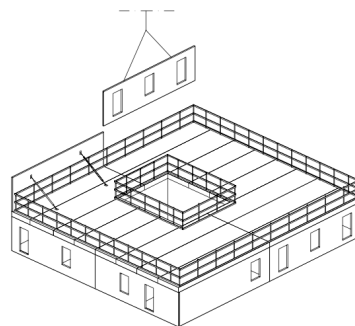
Assemblage of a prefabricated CLT wall
